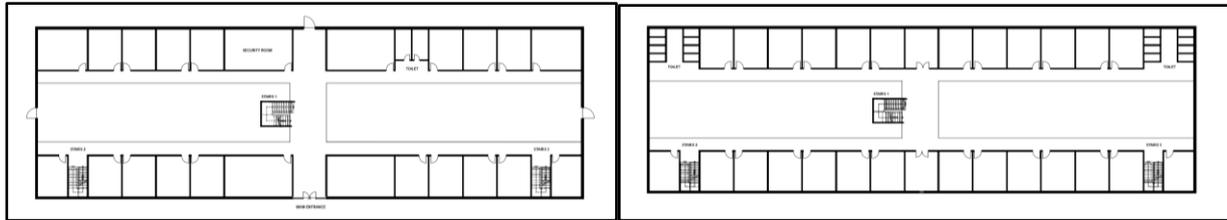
(a) Ground Floor Plan; (b) Second-Fifth Floor Plan
